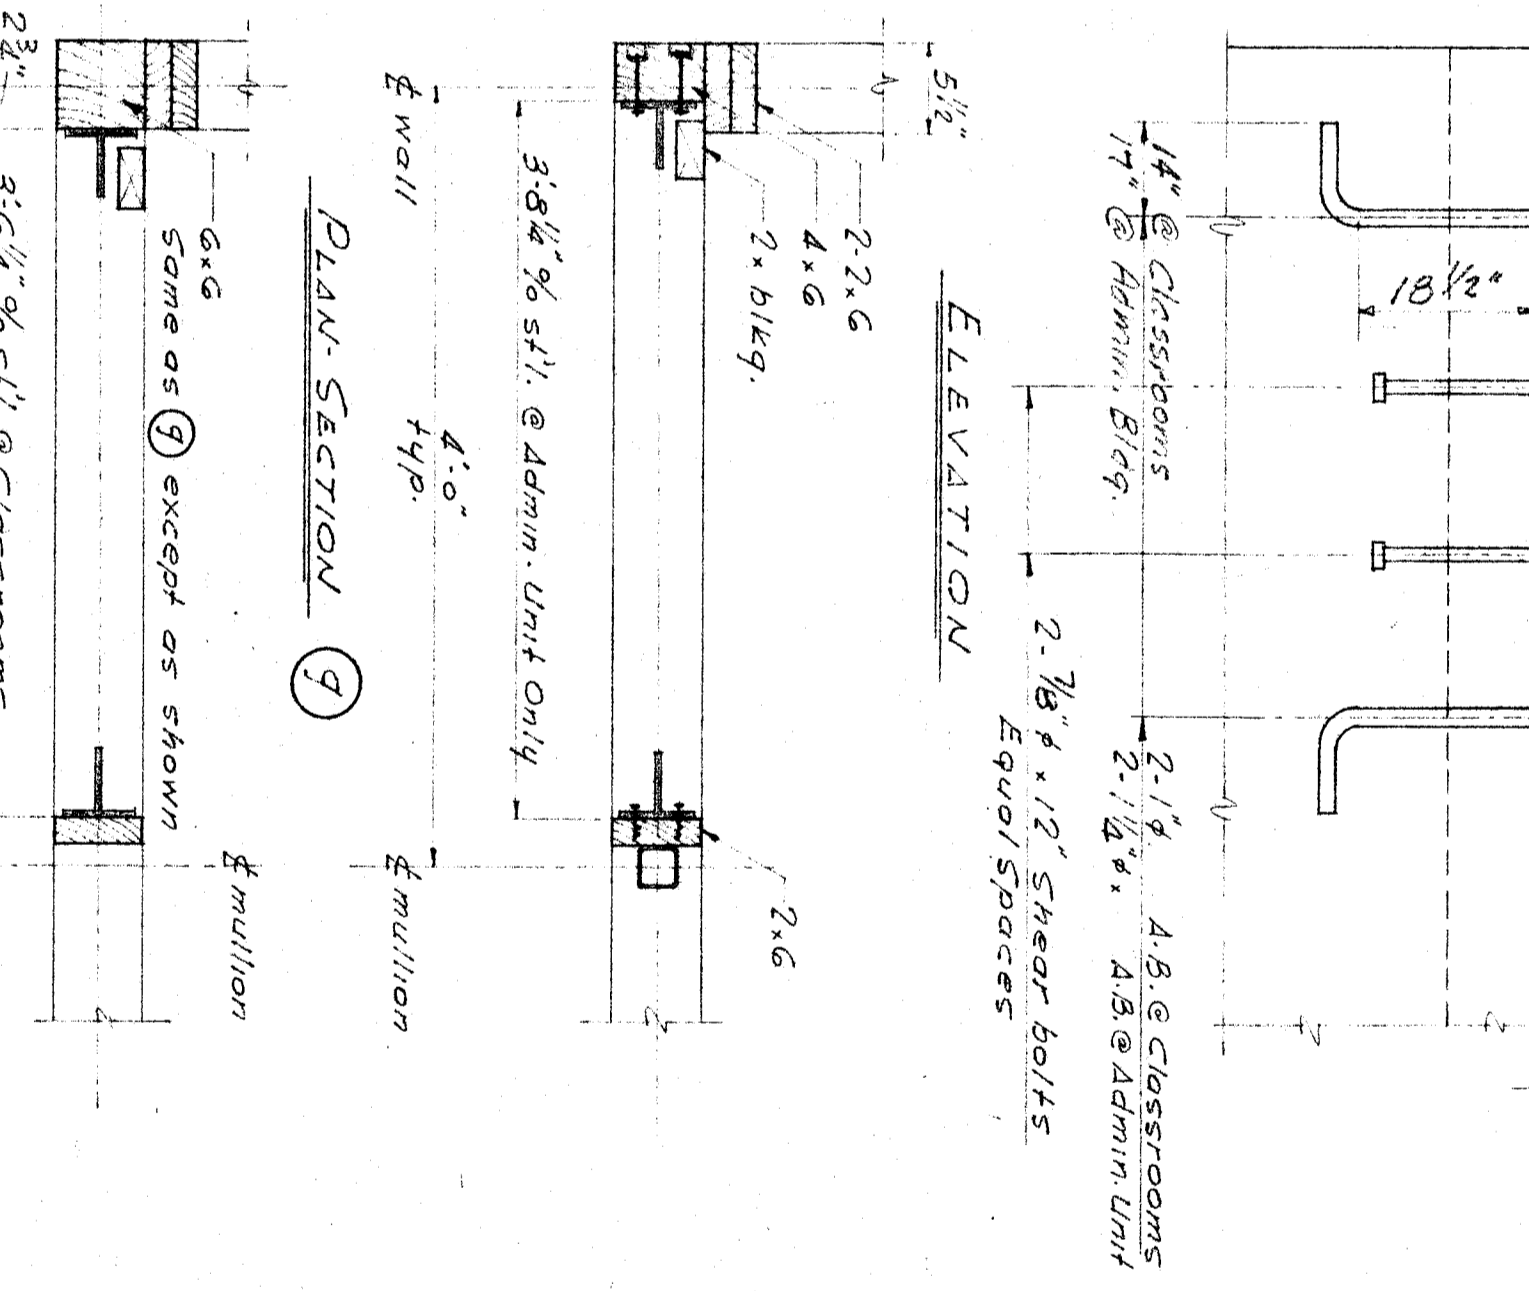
DETAIL - PLYWOOD PANEL ELEVATIONS
